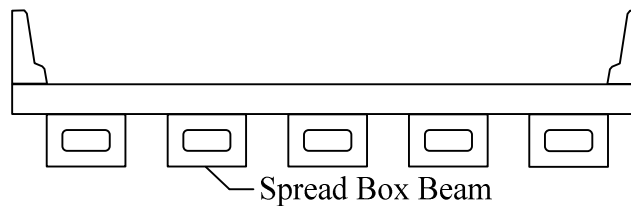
PS CONCRETE SPREAD BOX BEAM
